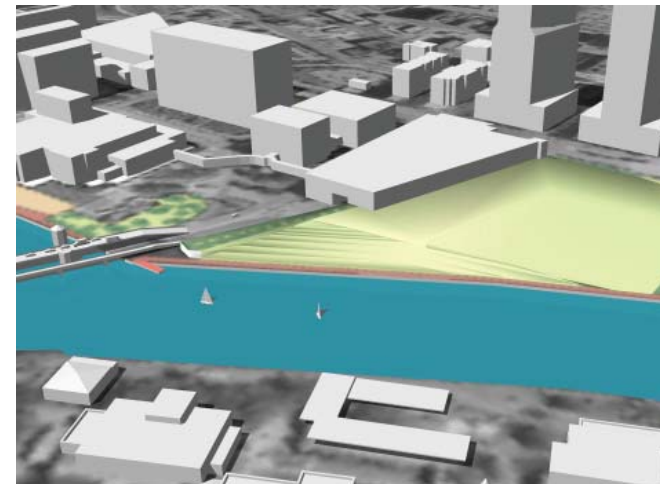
Option 1 – Cass/CSX Bridge: under bridge connection.
